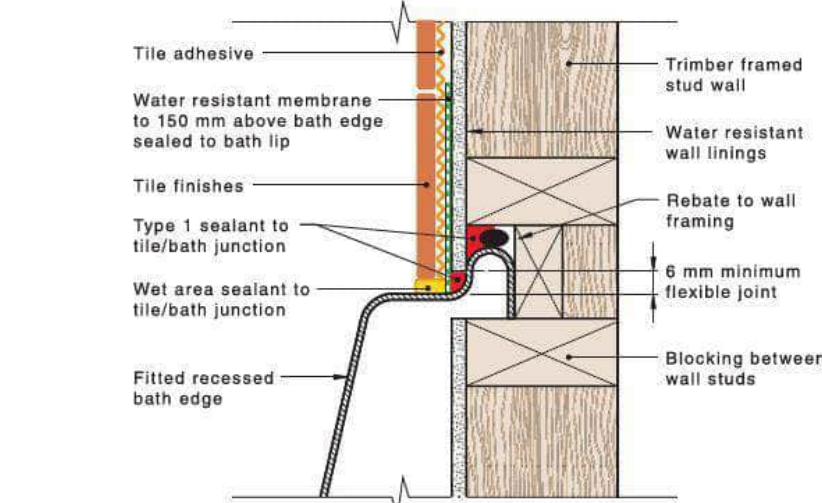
(D) — Bath with no shower over it — Fitted bath — Timber-framed wall
